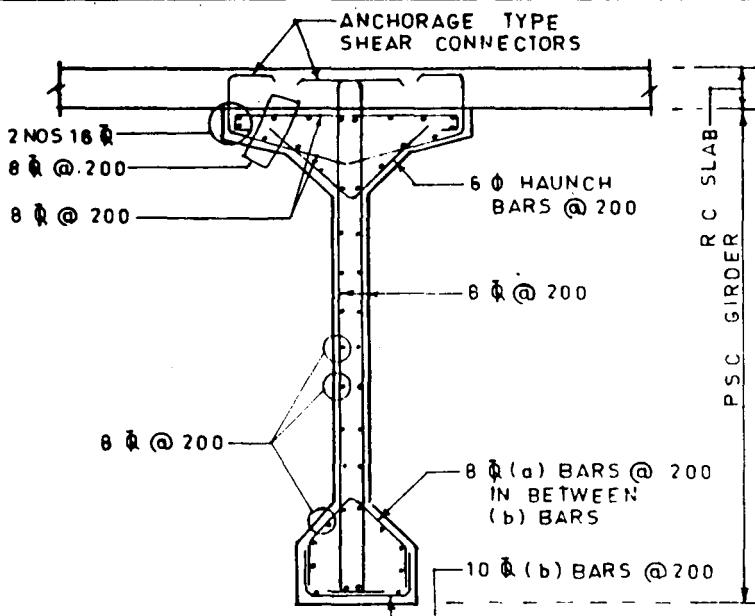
NOMINAL NON-TENSIONED REINFORCEMENT
